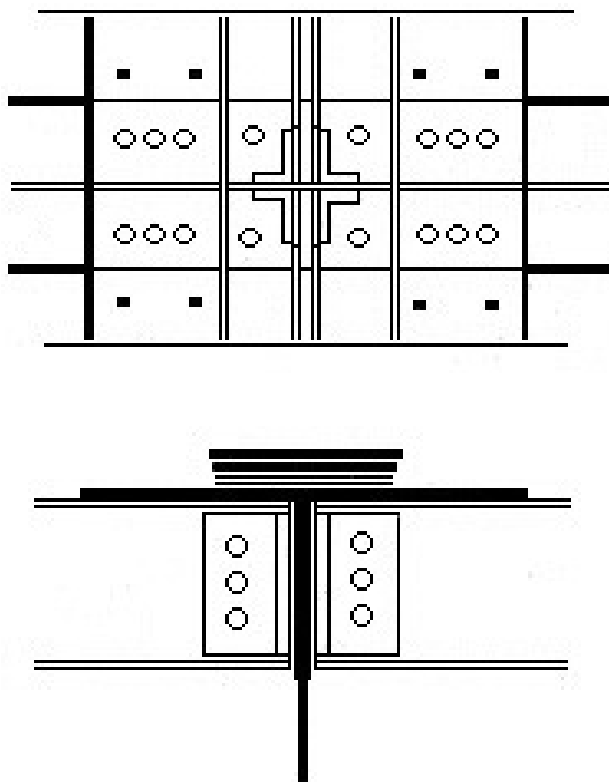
Detailed connection between transversal girder and stringers from refined original drawings.
